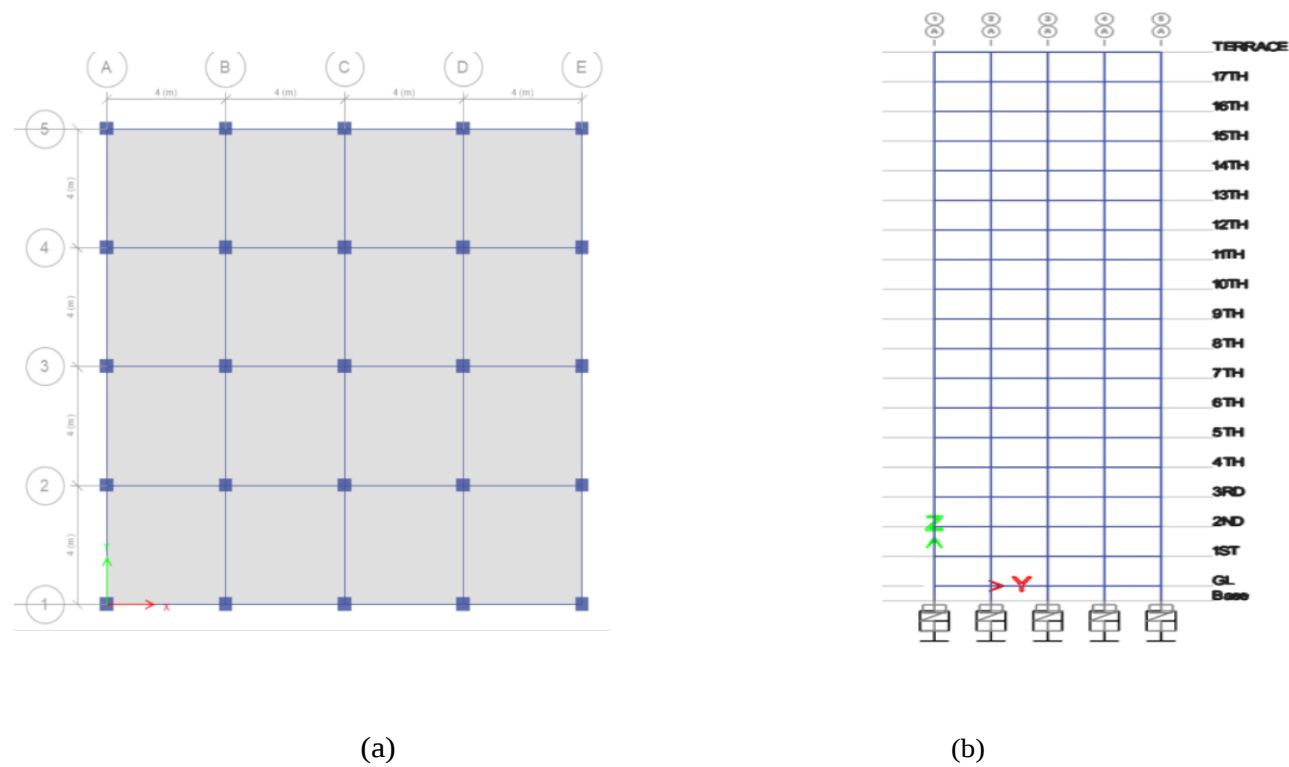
(a). Plan view and (b) Elevation view of 18 storey building
